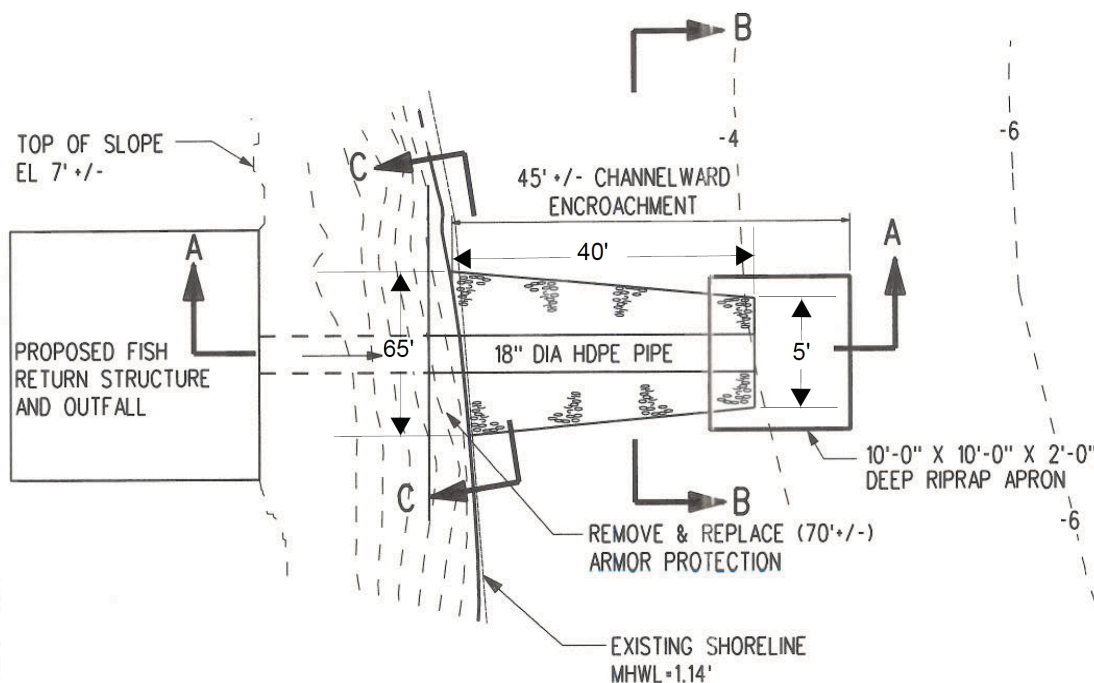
Fish-Return System, Plan View (USACE 2011)
